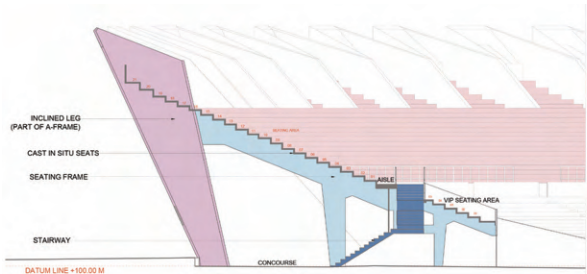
(right bottom): Nomenclature of different building elements identified in the part sections and elevations of SVP Stadium
